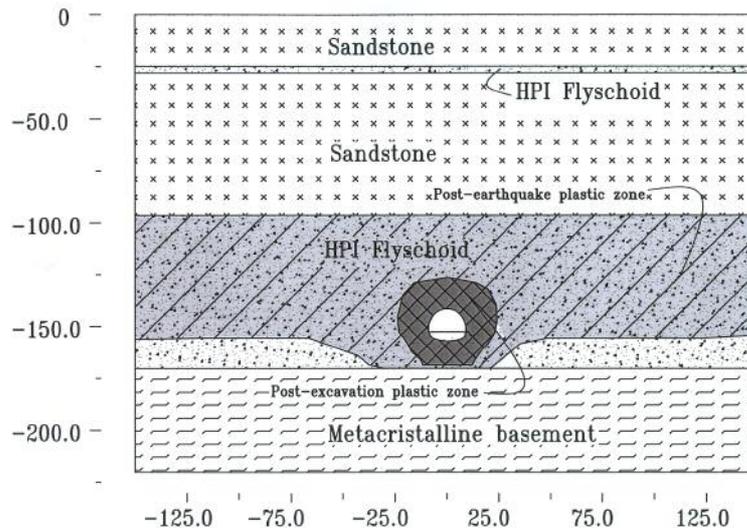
Model grid, layering and extension of the plastic zones, after excavation and after the earthquake.
